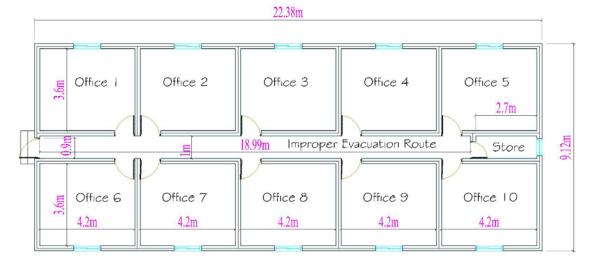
Poor Conceptual Floor Plan of the Administrative Building of the Market
